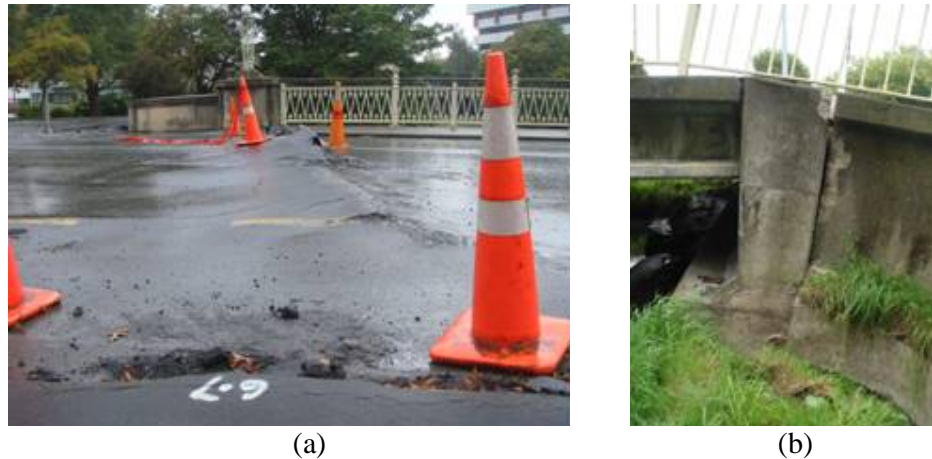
Typical damage to road bridges within or near the CBD during the 2011 Christchurch Earthquake: (a) Colombo Street bridge; and (b) Fitzgerald Avenue bridge
